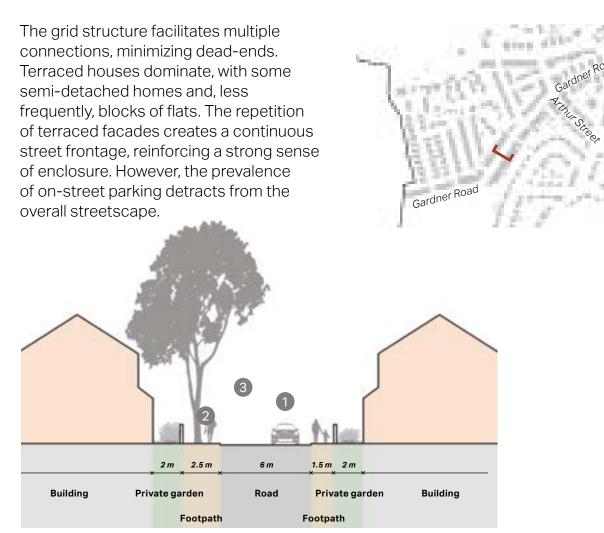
Existing Street showing a typical Neighbourhood Route at Gardner Road facing northeast.
